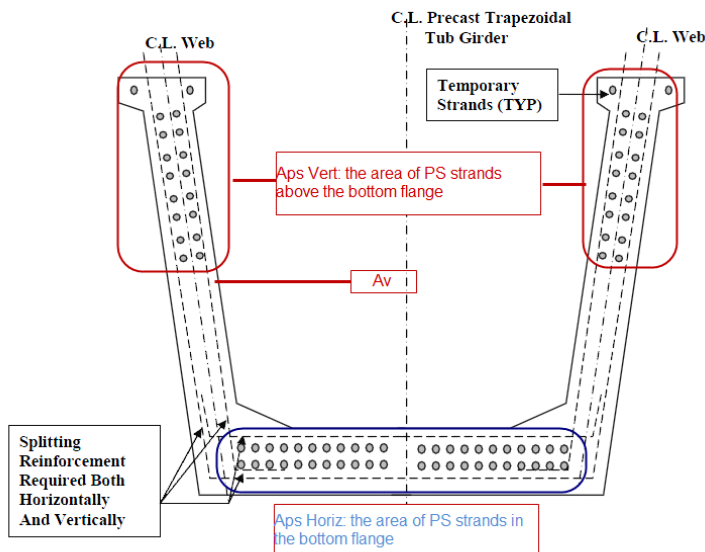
Precast Trapezoidal Tub Girder
